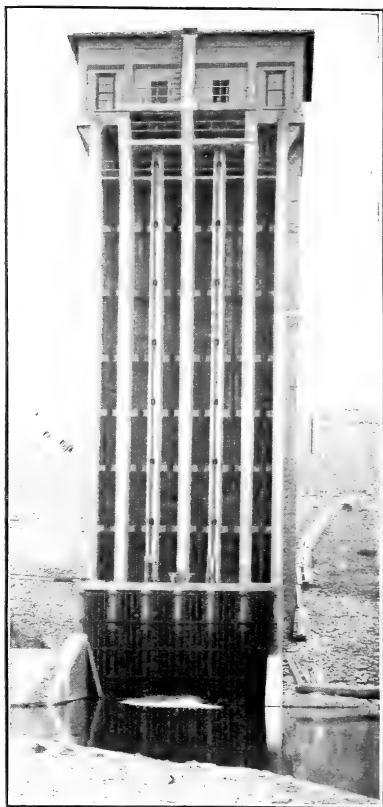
OUTLET GATES AND TOWER, LAHONTAN RESERVOIR, NEVADA.
